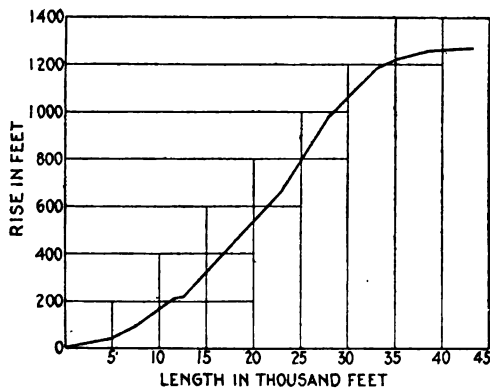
PROFILE OF LOGGING ROAD NO. 2
